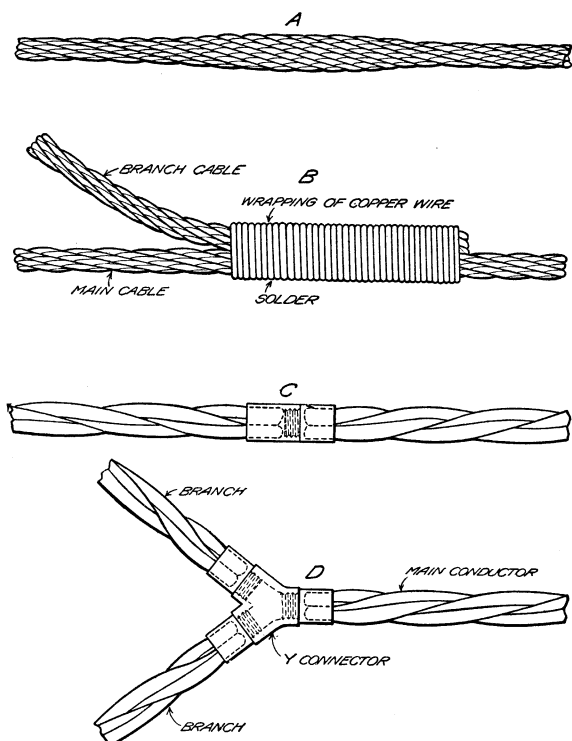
Types of conductor joints. (A) End to end splice of copper cable; (B) joint of branch to main cable; (C) end to end joint for star-section rod; (D) branch connections, star-section rod.
